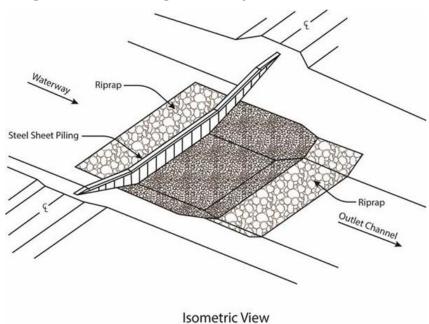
Isometric View of a Sheet Pile Check Dam
